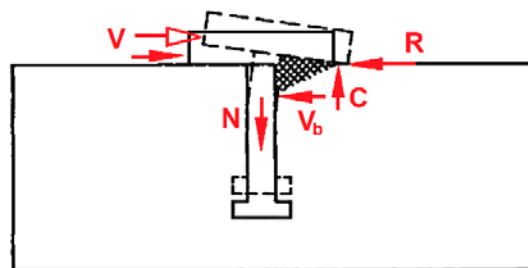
Concrete pry-out failure mode [Eligehausen et al. 1992]
